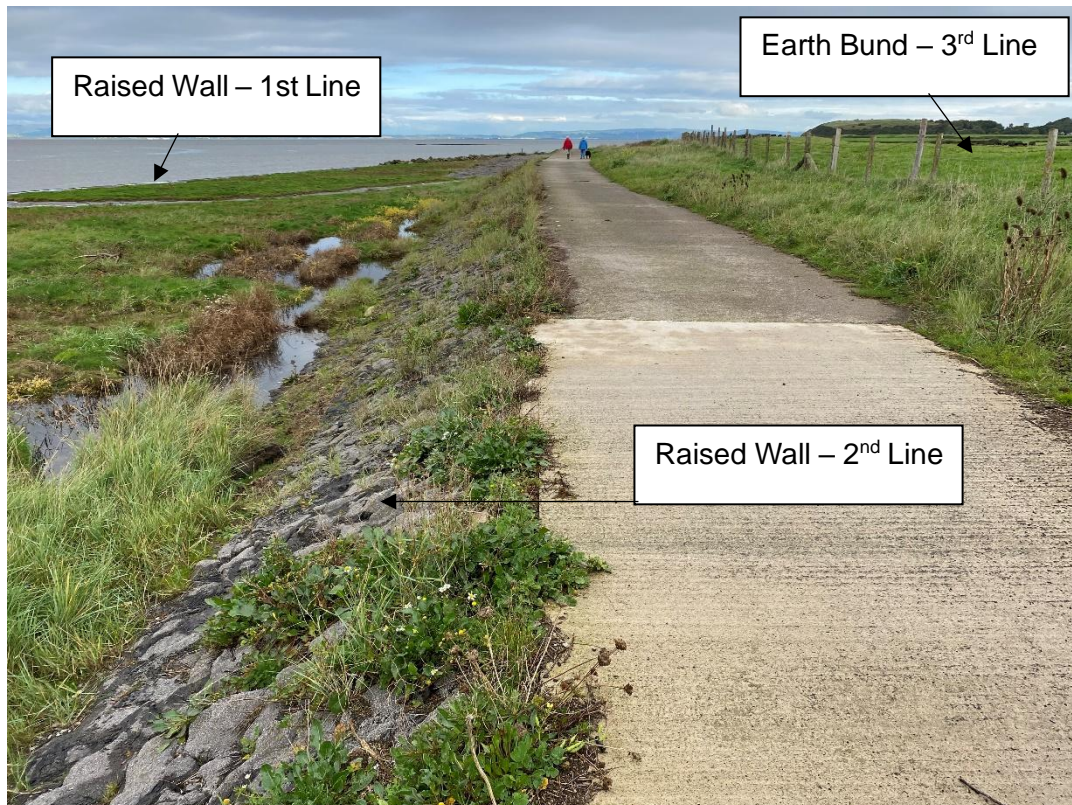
Site Photos of 3 tiered flood defence. Taken during site walkover 9th October 2024.
